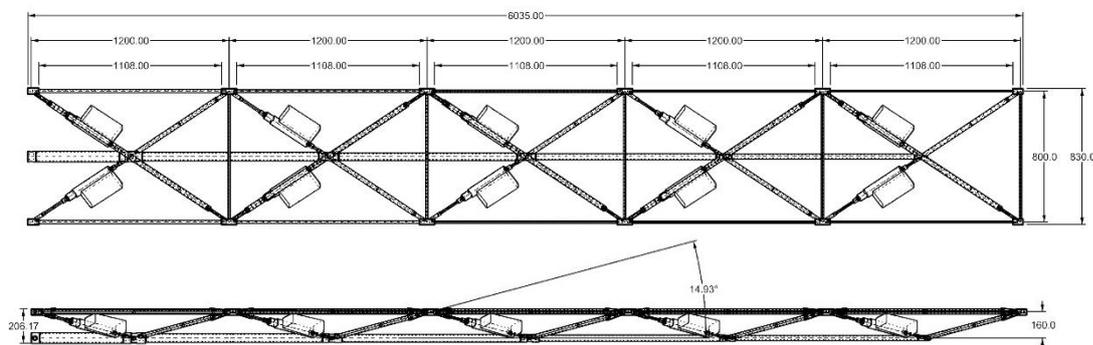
Adaptive truss plan and elevation with overall dimensions (mm)
